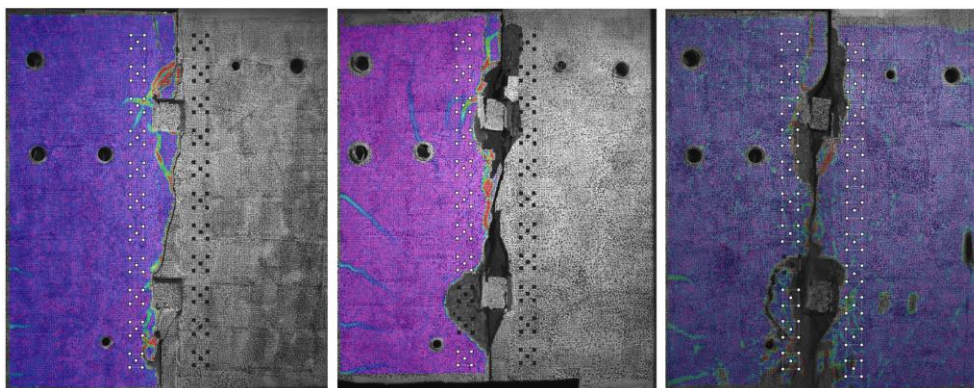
Observed specimen failure mechanisms after the peak load (from left to right) SA1T1: 1081kN; SA1T2: 1306kN; SA1T3: 1191kN;
